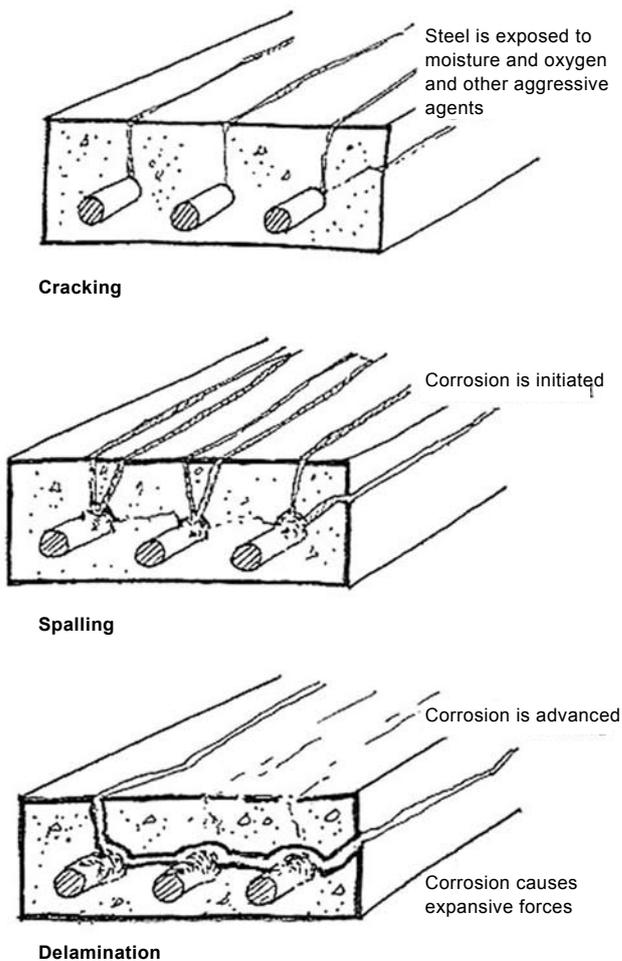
Progression from cracking to spalling to delamination in corroding reinforced concrete.
